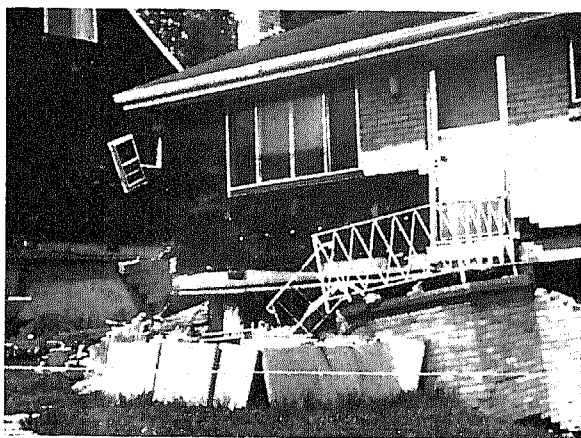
A house damaged by subsidence caused by the collapse of pillars in an abandoned underground mine.
